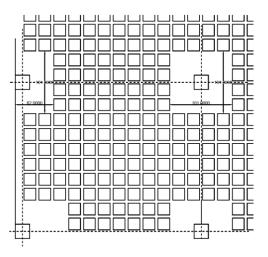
Plan View of Waffle Slab and Drop Panel Distribution
